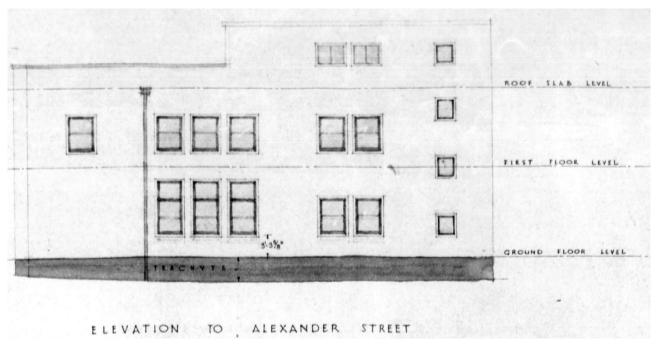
Extract from plans for Rural Bank Crows Nest Branch showing Elevation to Alexander Street. *Source: North Sydney Council Buildings Application Archive.
